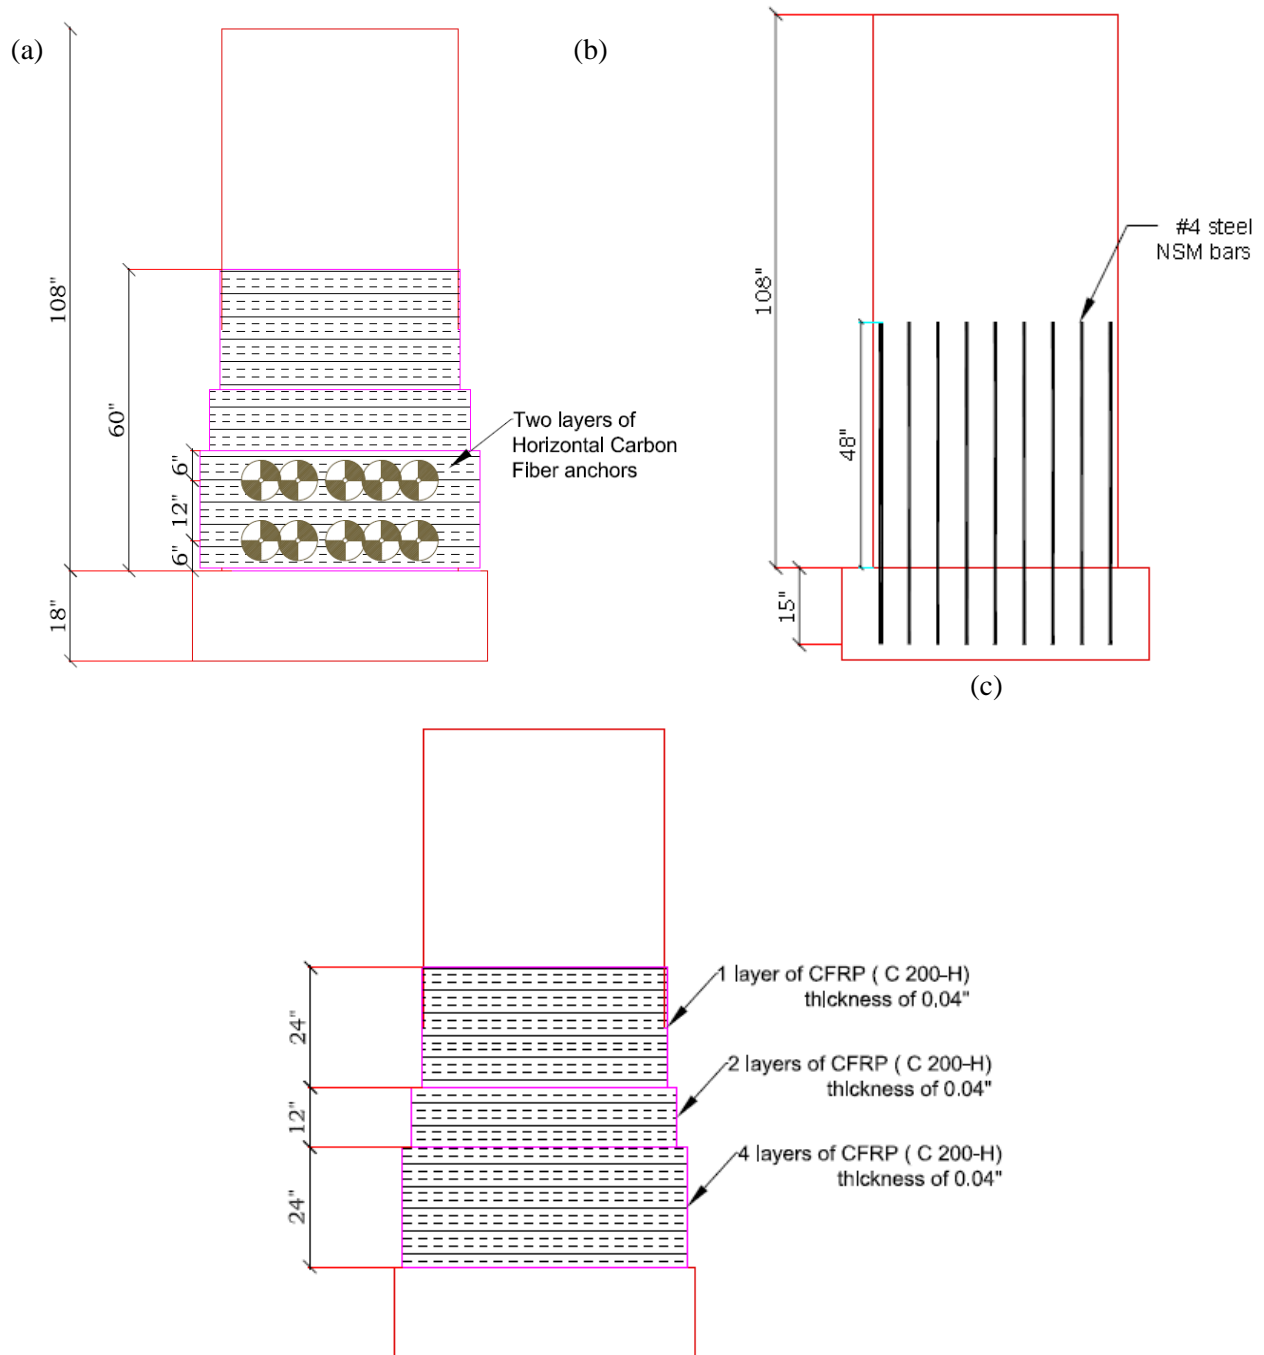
Retrofit design of specimen ABRP: (a) steel NSM bars (b) horizontal CFRP anchors, (c) hoop direction CFRP wraps
